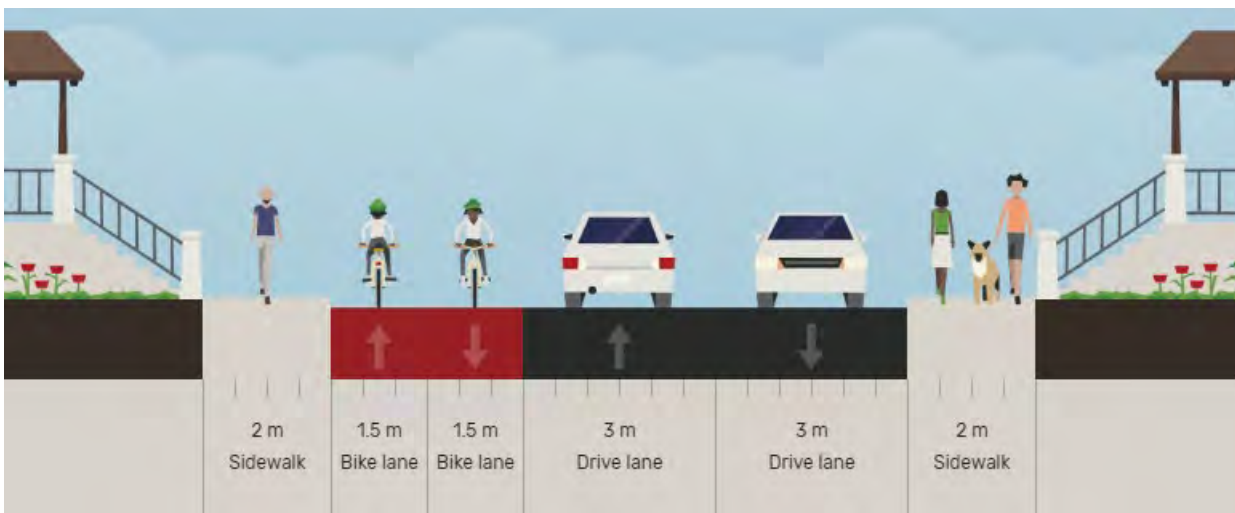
Church Road/Rock Road Option 2 – Cross-section
